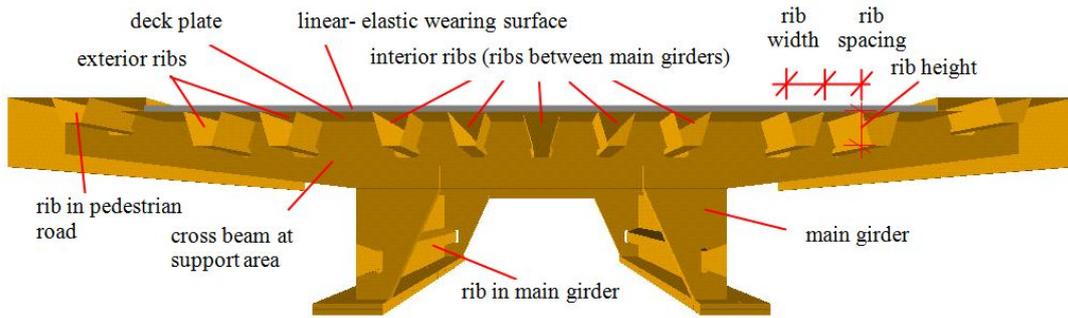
Traditional orthotropic steel bridge as to DIN FB 103 (2003)
